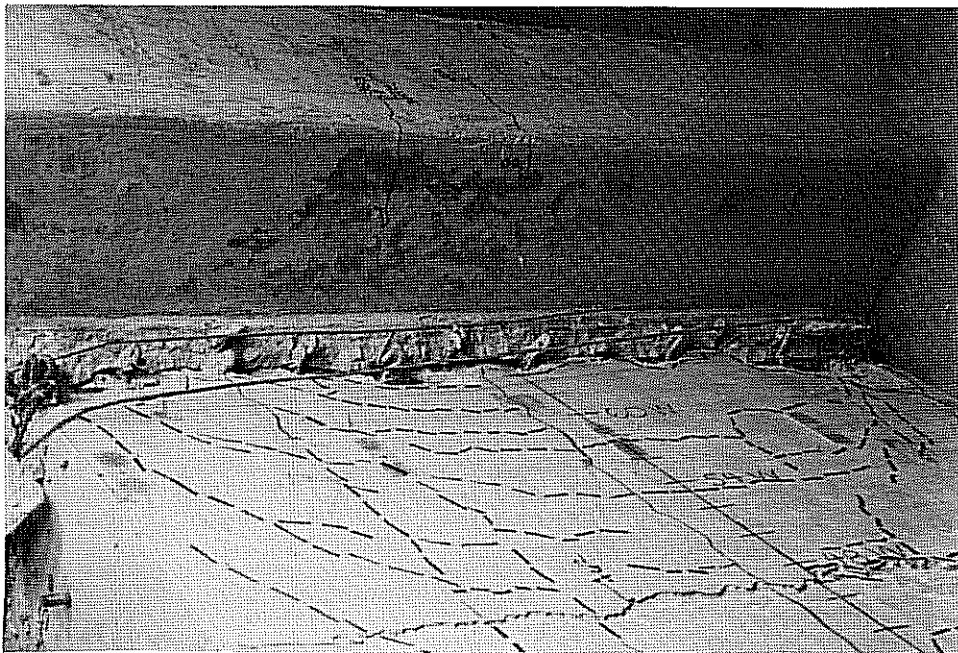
Specimen 10ML18 Compression Flange Displacement at Failure
